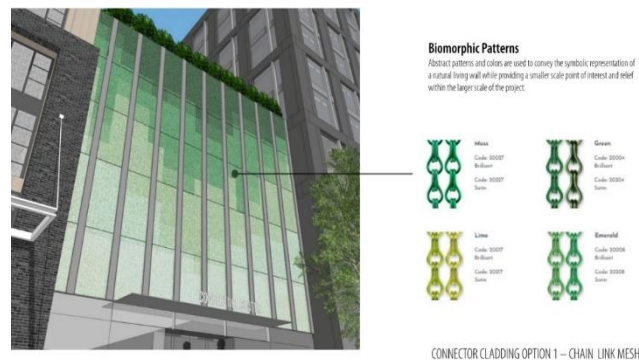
Northeast perspective of Block P with callouts to the proposed revisions.
